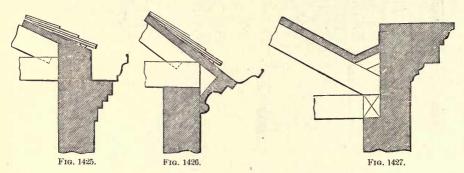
represents a form of gutter very common to city buildings, the roof boarding extending over the gutter; but it is preferable to make the roof pitch from both rear and front to the centre of the building, and to carry the
